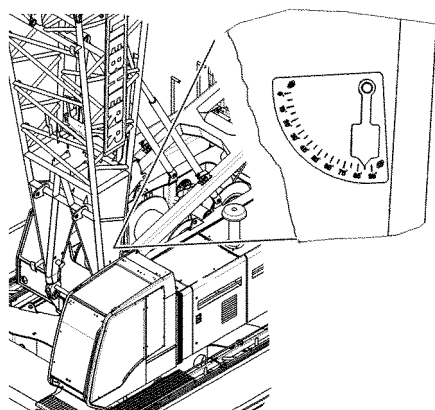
Mechanical boom angle indicator on boom base section or A-frame 1
